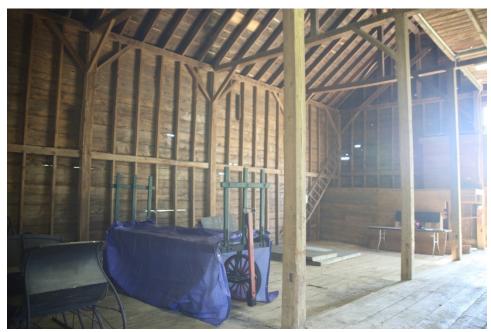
North aisle, hay storage area in northeast corner Direction: NE
